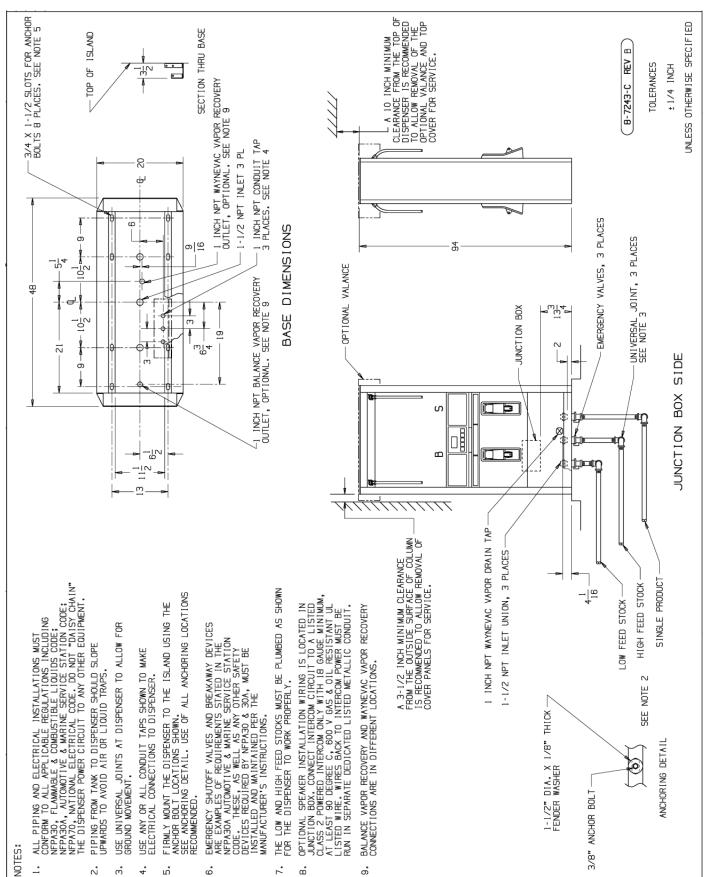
8-7243-C Installation Instructions - 4/V595D (Remote) - Except 4/V595D/U See 2-7243-C
